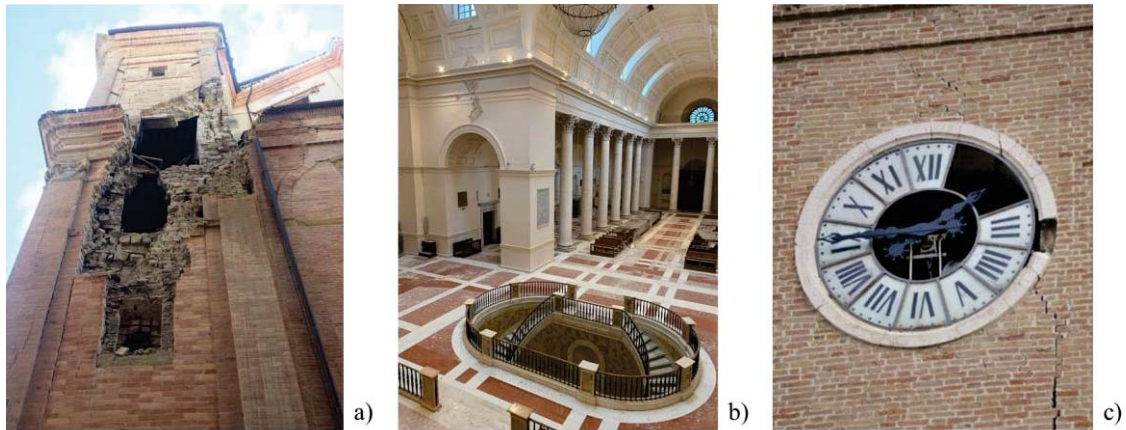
Some cracks after the Central Italy Earthquake, a) Partial collapse of one façade side of Santa Maria in Via; b) Cracks spread on the walls and the vault of San Venanzio; c) Crack in correspondence of the Clock of one Santissima Annunziata bell-tower
